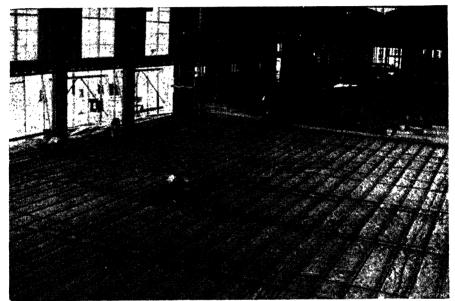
Floor installation in chapel. (A. M. Byers Company.)
